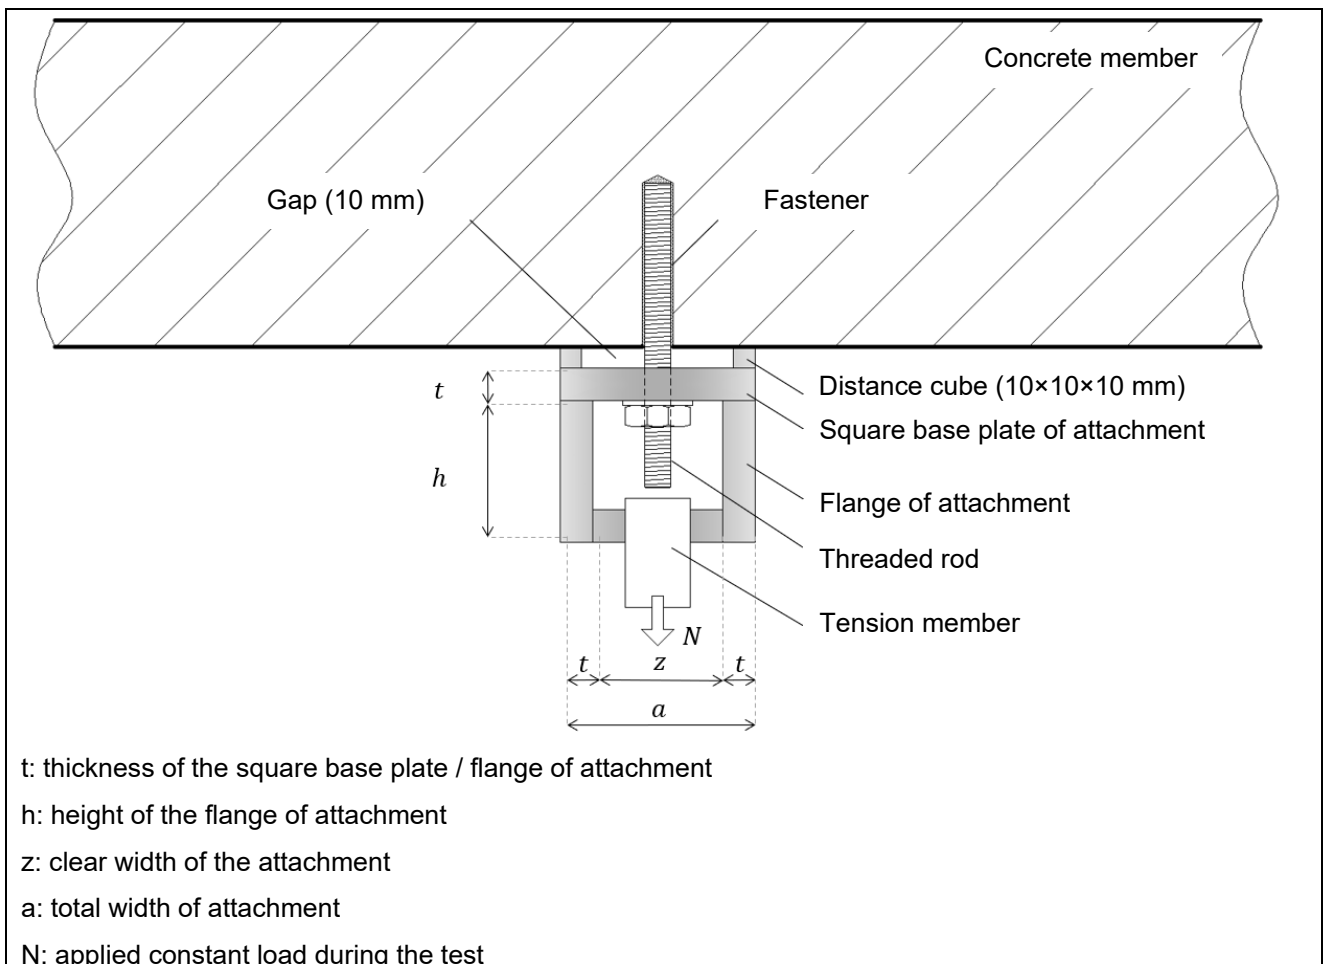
Test setup for the determination of the steel failure under fire exposure
